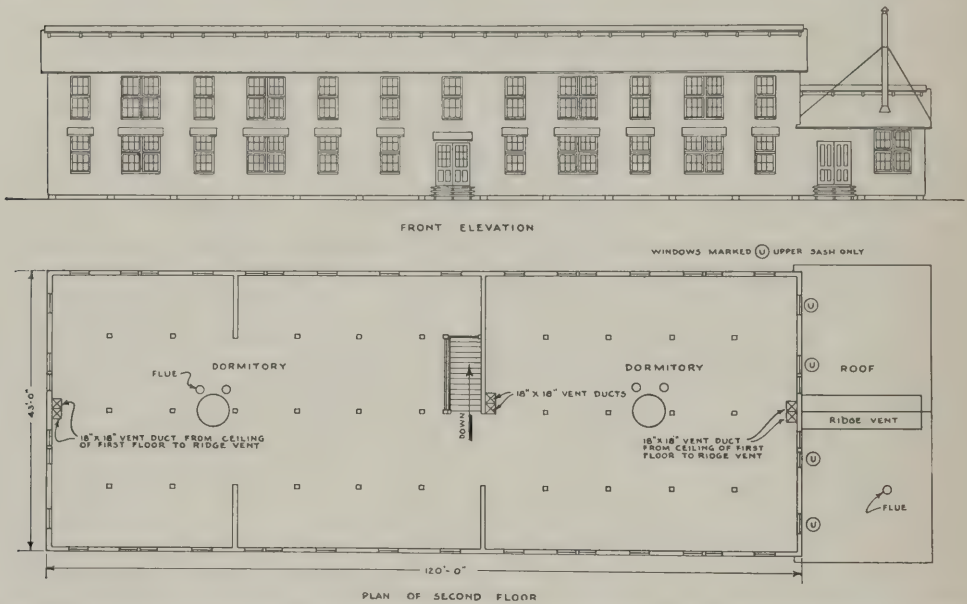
Two-story barrack with full ridge ventilation, originally intended for 200 men, allowing about 36 square feet of floor space and 362 cubic feet of air space per capita—43 by 120 feet; for a company of Infantry
